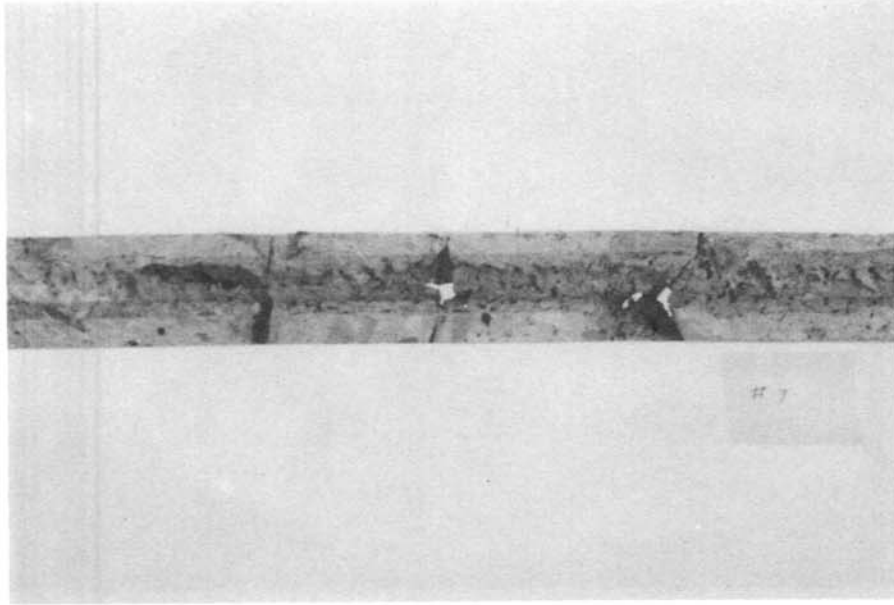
Slice of concrete below transverse reinforcement on Sample No. 7. In some cases, voids are continuous from the bottom surface to the steel reinforcement.
